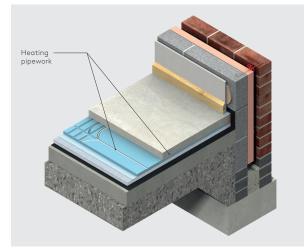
Intermittent heating applications - installed onto solid concrete floor underneath screed
